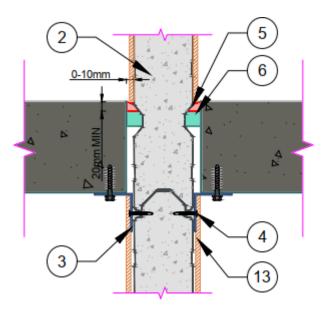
Dual wall system with vertical wall between horizontal walls –gap width of 0-10 mm between the stair and horizontally oriented wall
